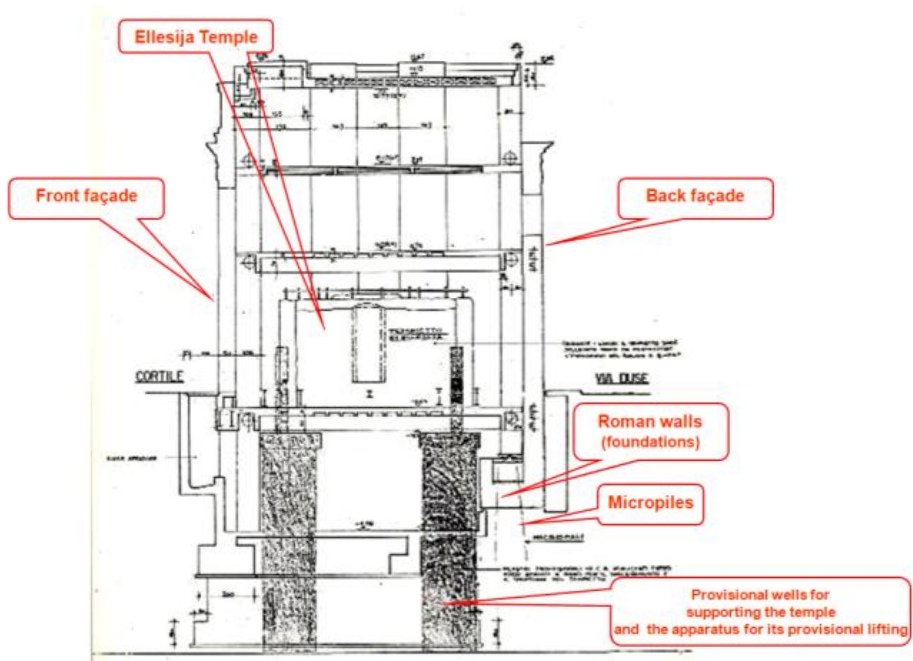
Cross section of the Ala Schiaparelli with indication of the structural interventions.
